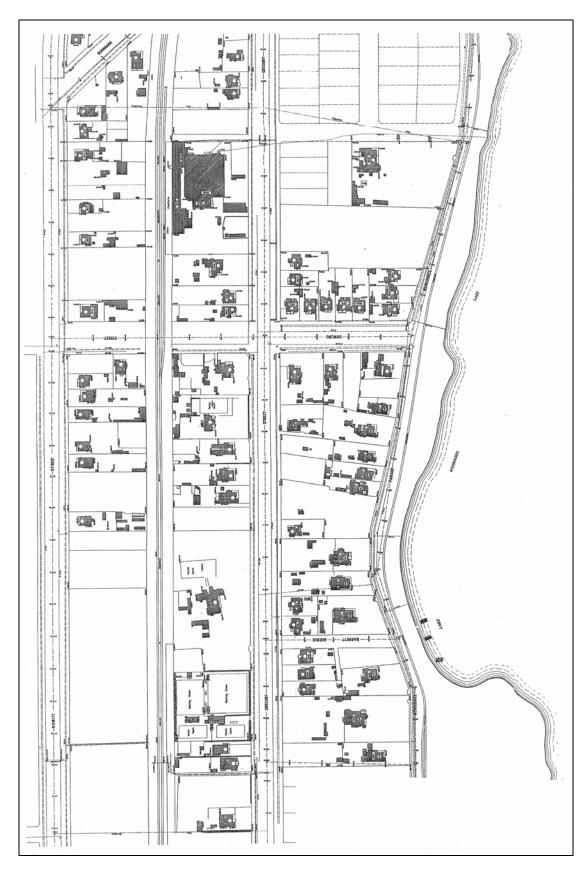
Ballarat Sewerage Authority Plan, 29 October 1934. Source: Wendy Jacobs.
